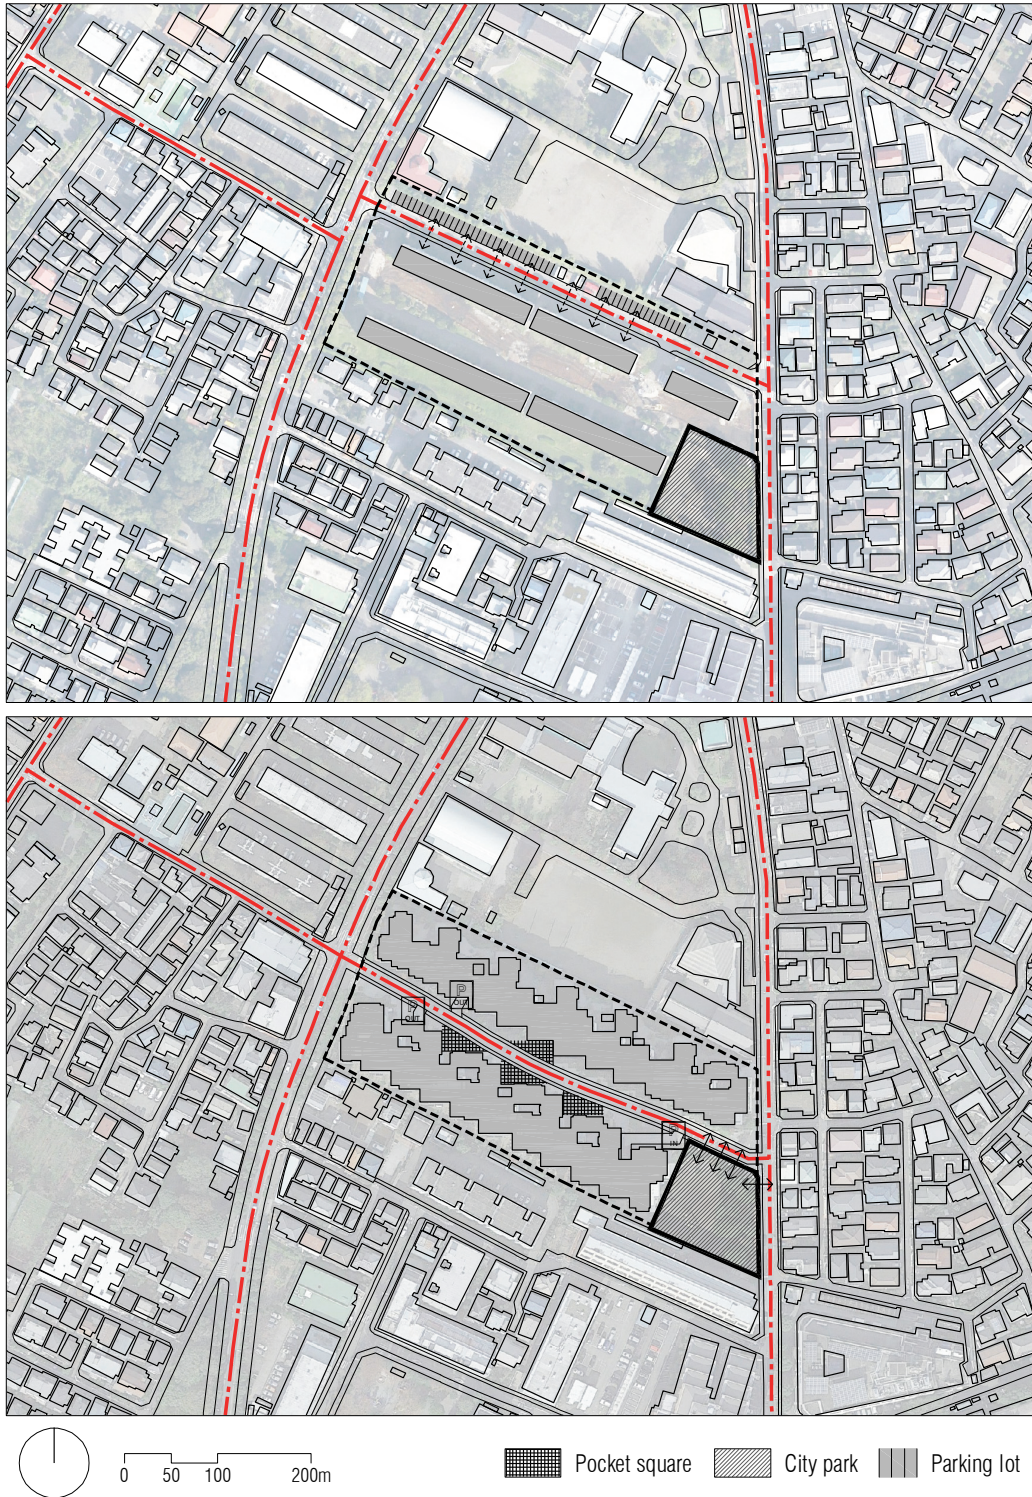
Site plan of Chofu Fujimi Housing (Upper: before; lower: after)
